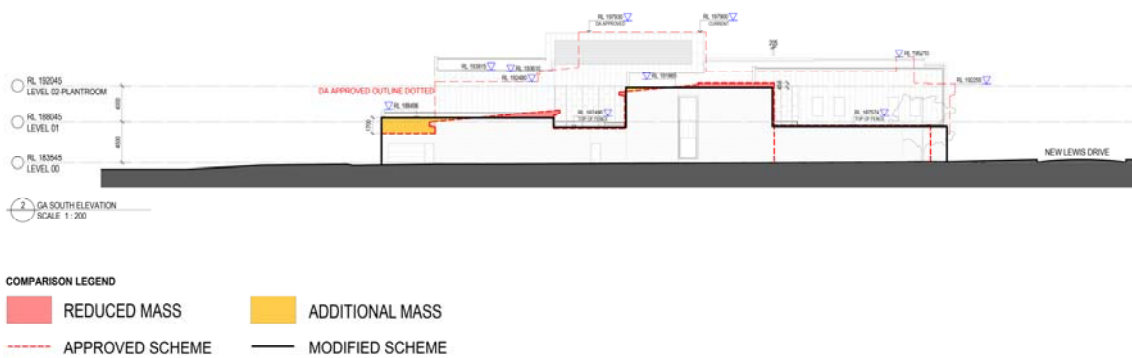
South Elevation comparison drawing (Source: Woods Bagot)
